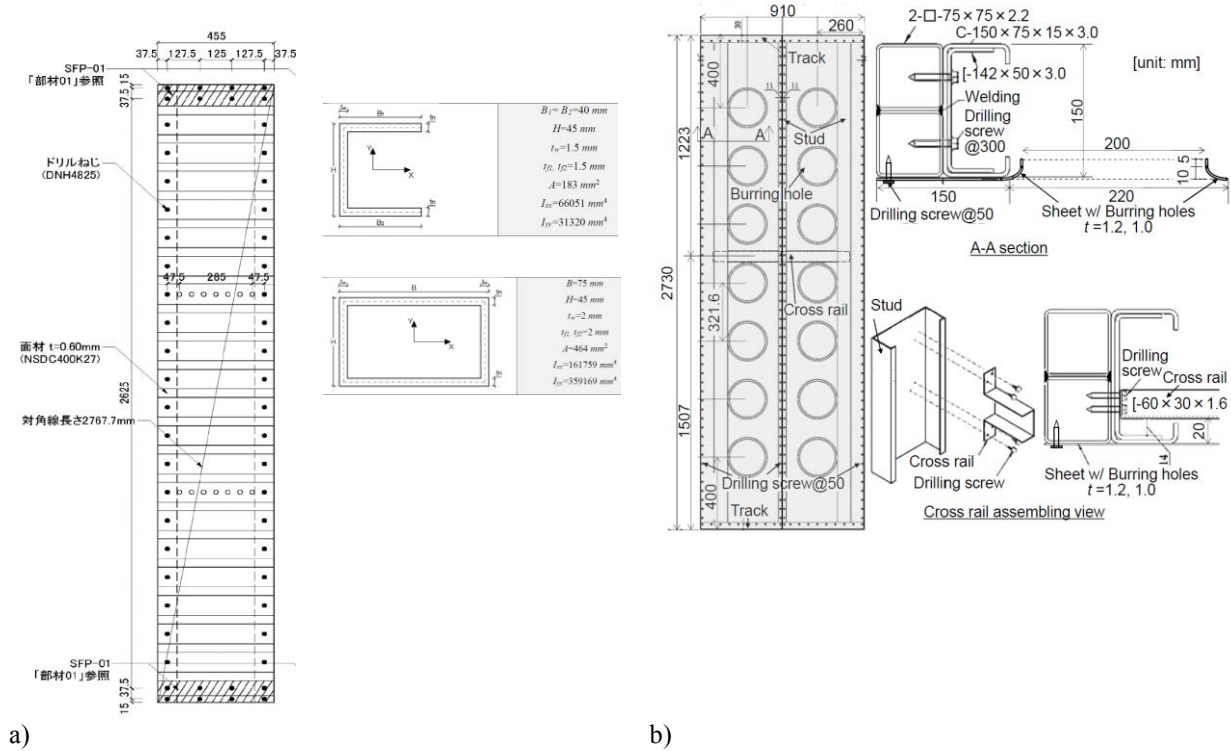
Experimental campaigns analyzed: a) the corrugated shear walls. Figure from [16], and b) the steel sheet shear wall with burring holes. Figure from [12].
